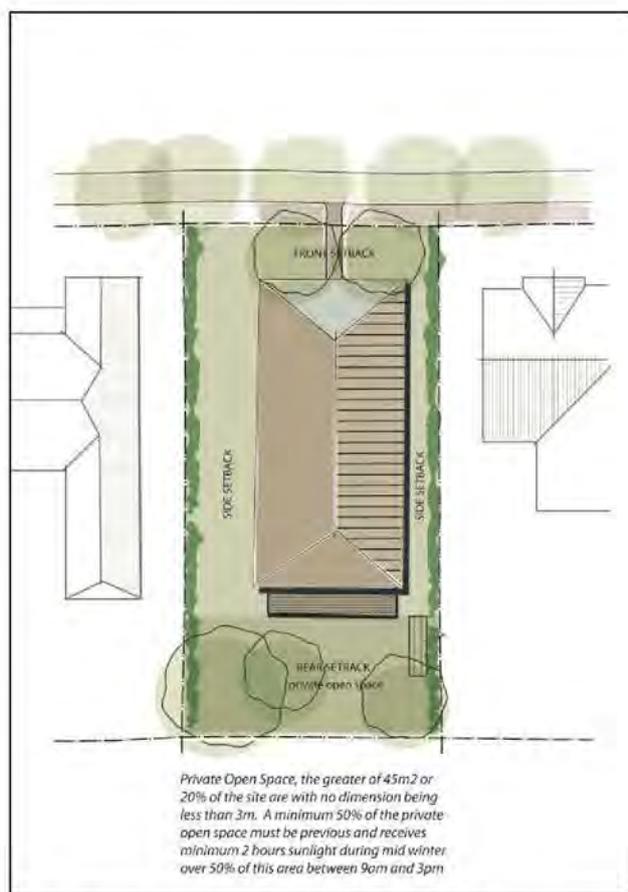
The location of private open space for a dwelling house, attached dwelling house or a semi-attached dwelling house
